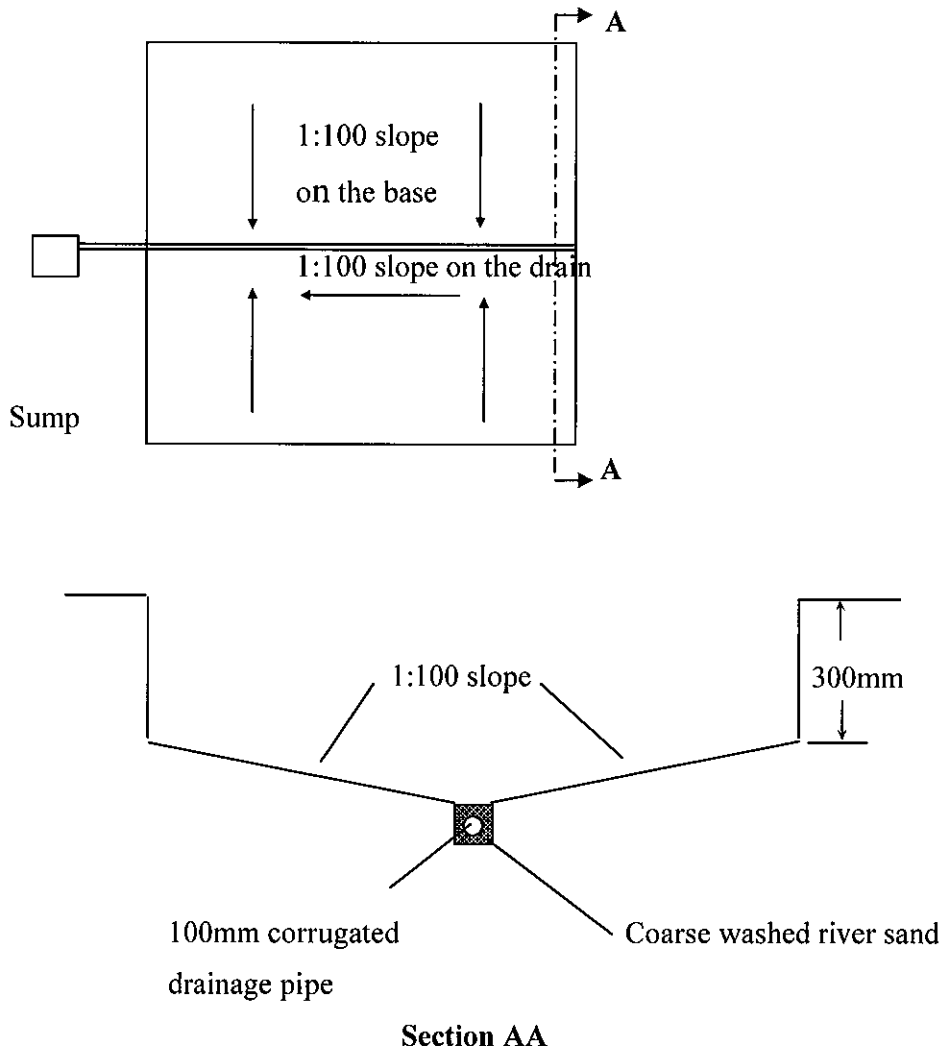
Shows the location of the central drain, and the slope on the base of 1:100 to the centre. Section AA shows the depth of the excavation and the base.
